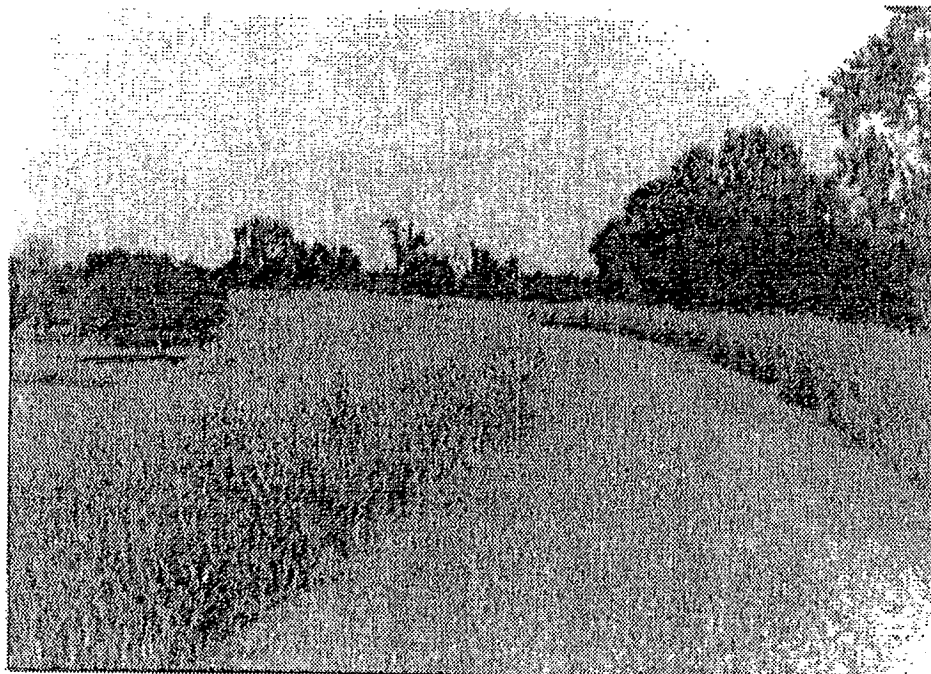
Site 7 - Typical levee along this site. Looking upstream from boring 2F-92-15. (April 28, 1992)
